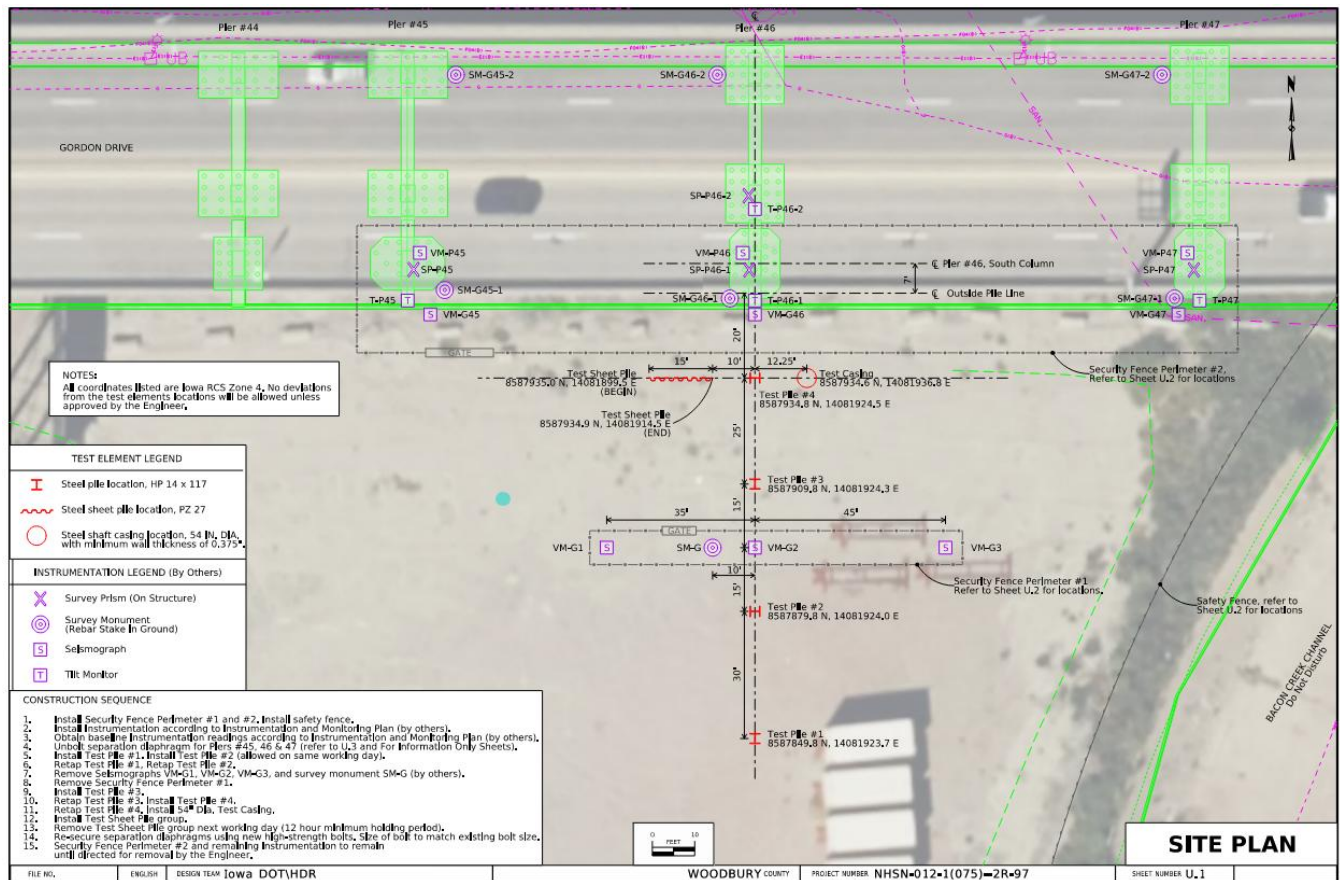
Preliminary instrumentation plan showing test pile and monitoring locations.
